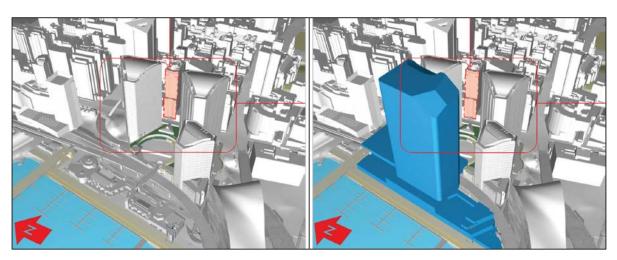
| The relationship of the existing Cockle Bay Wharf (left) and proposed building envelope (right) to the western elevation of the Astoria Tower (highlighted pink) (source: Applicant's RtS)
